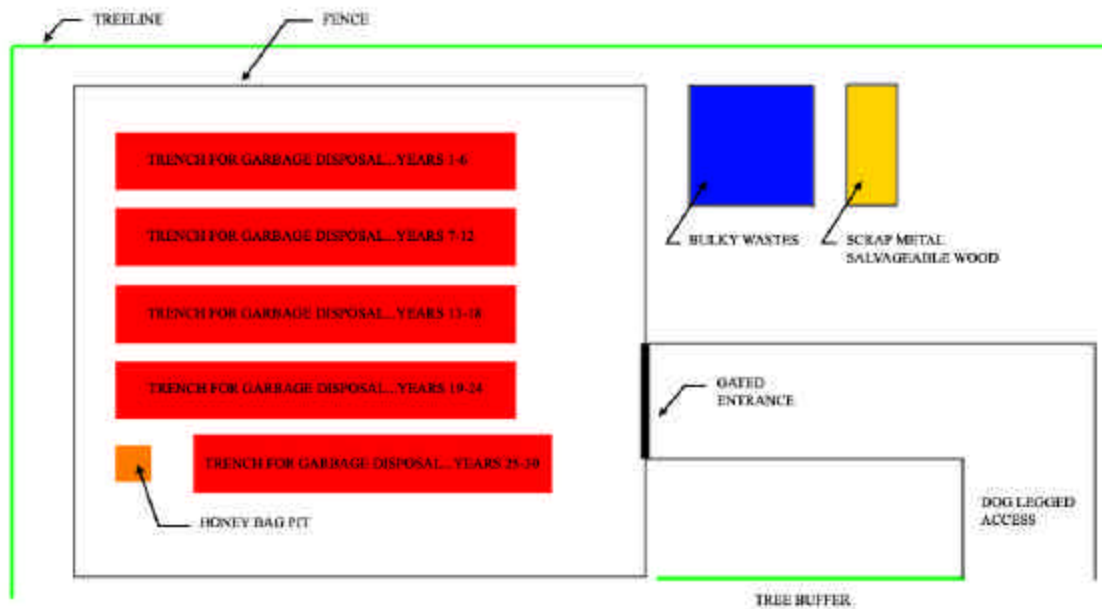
Example of the Layout for a Typical Modified Landfill Site
